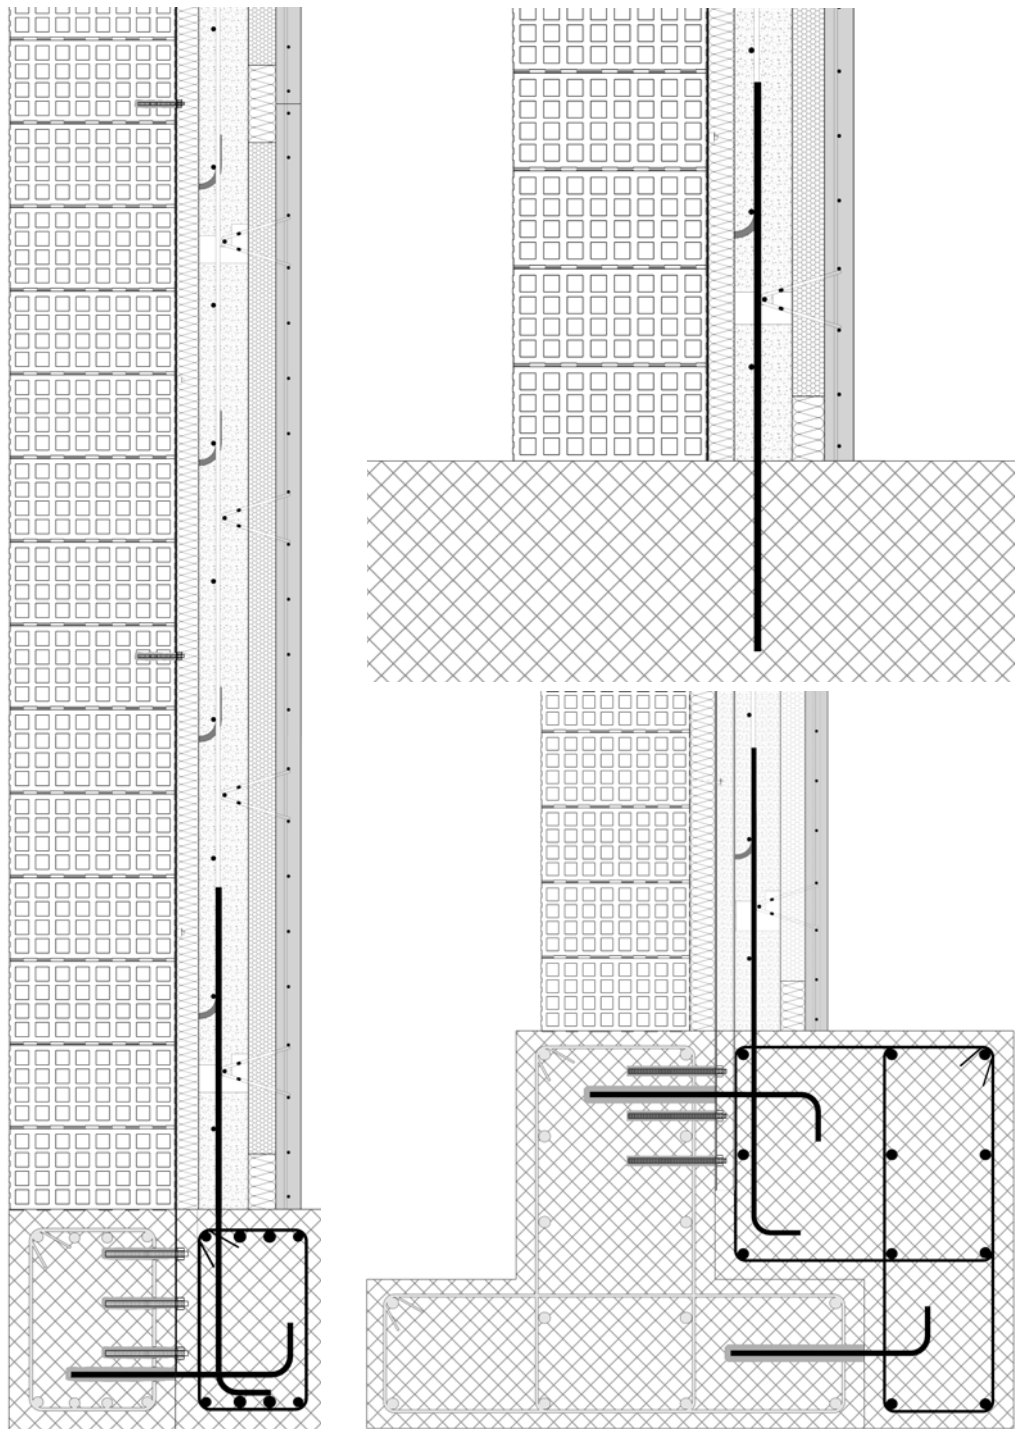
Base connection: three existing type of foundation. Source: Author
